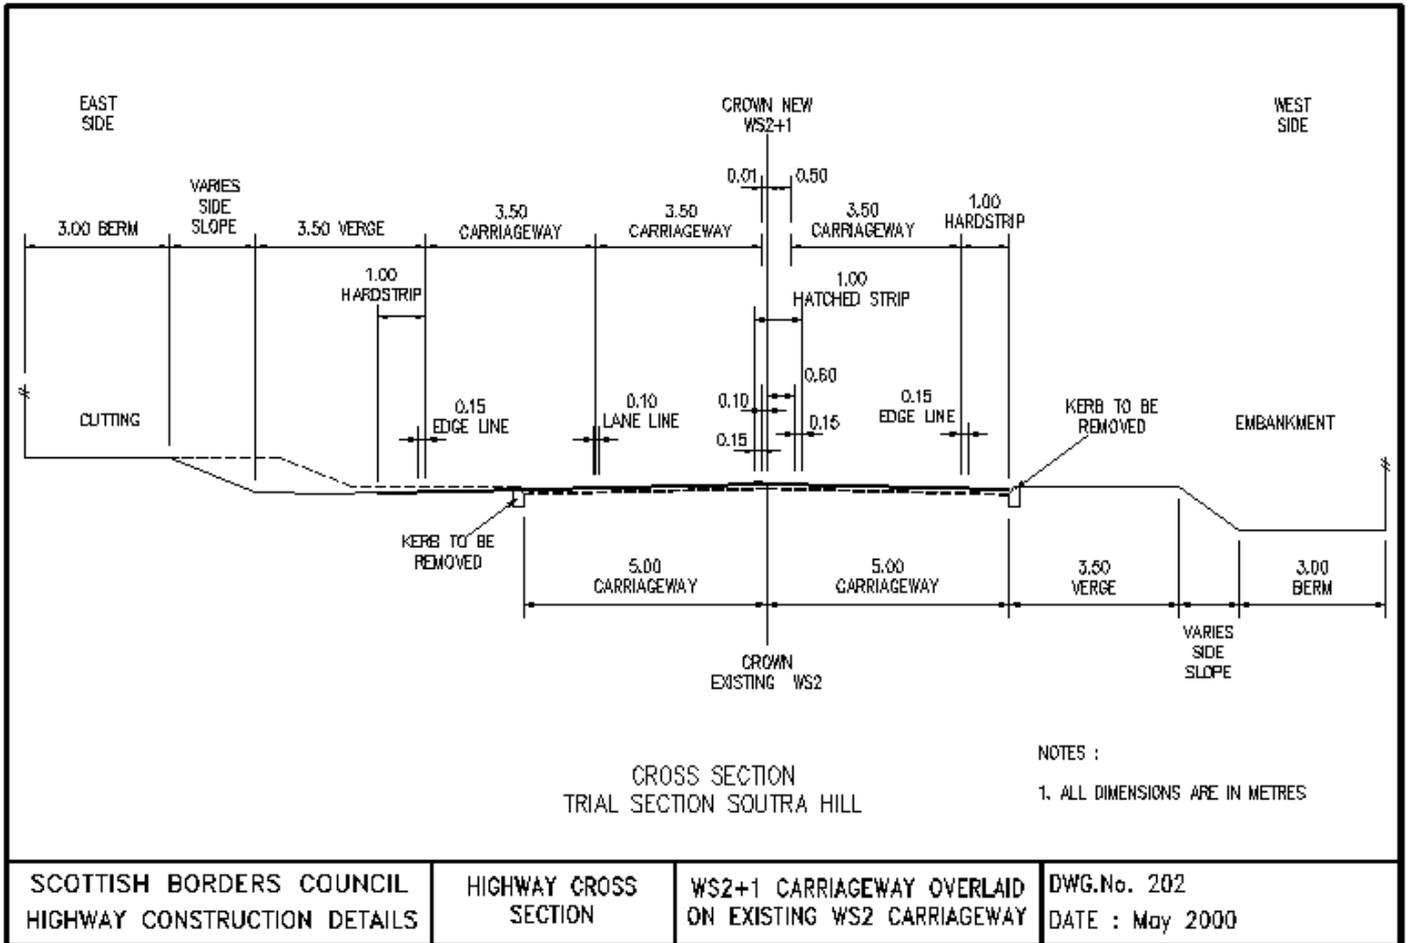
WS2+1 cross section at A68 Soutra Hill Scotland.
